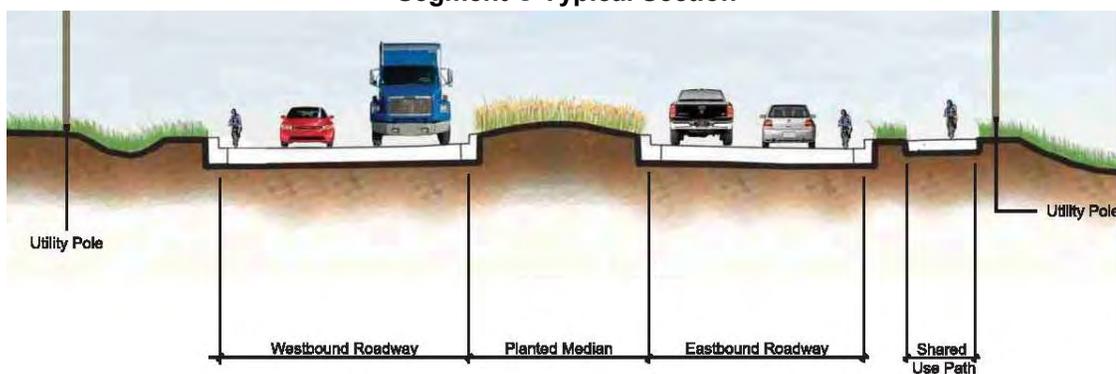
Alternative 3 Base Improvement Closed Section Segment C Typical Section
